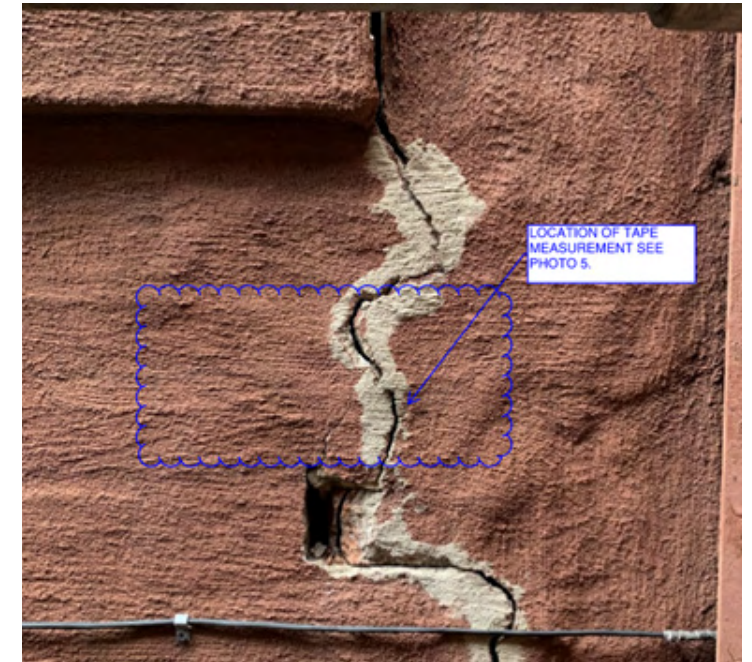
West Elevation – Close-up Crack at the Apparatus Floor Window
